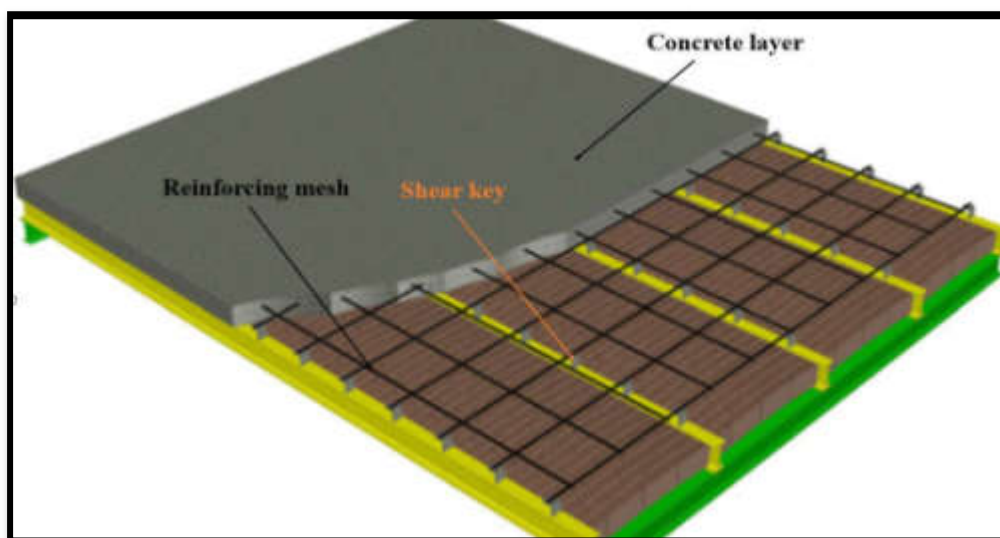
Retrofitting jack-arch slab by concrete layer method [16].
